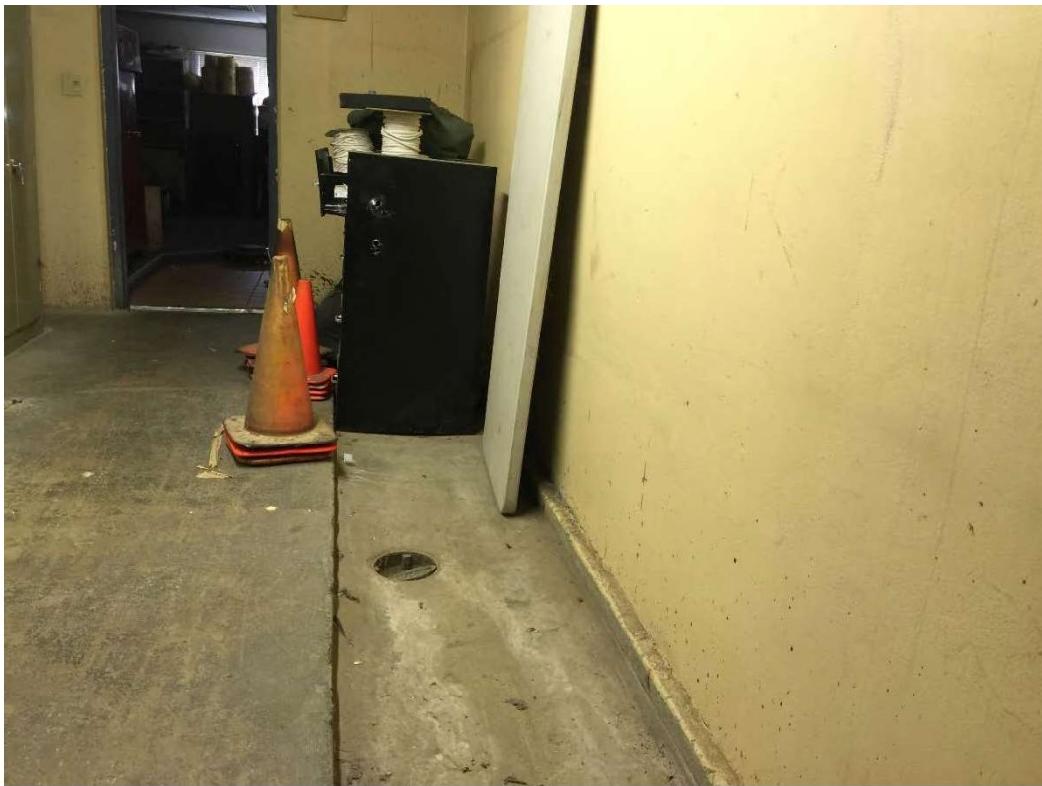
(7/8/2015)- View of hose wash-out area at former fire station. Floor drain is visible.
